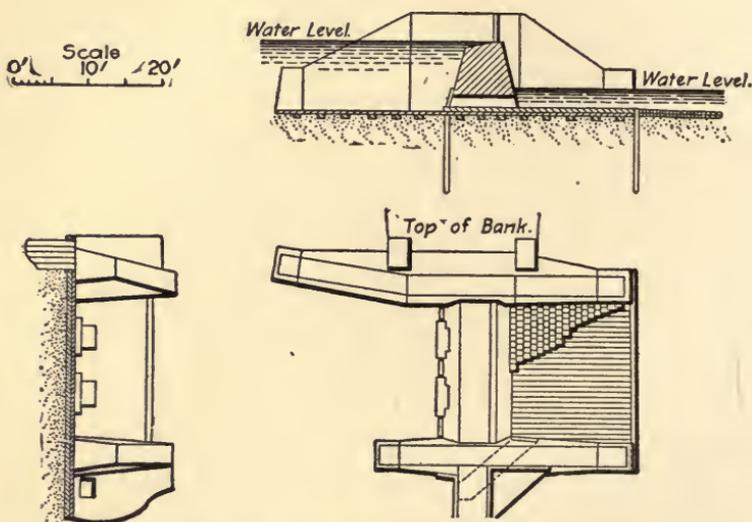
WASTE-WEIR ON SAND FOUNDATION.
